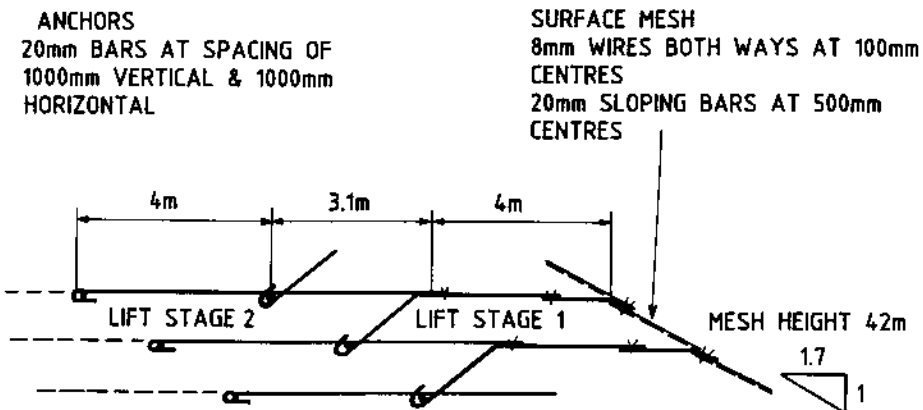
Steel mesh reinforcement for Googong Dam (Fokkema et al. 1977 and ANCOLD 1982).
